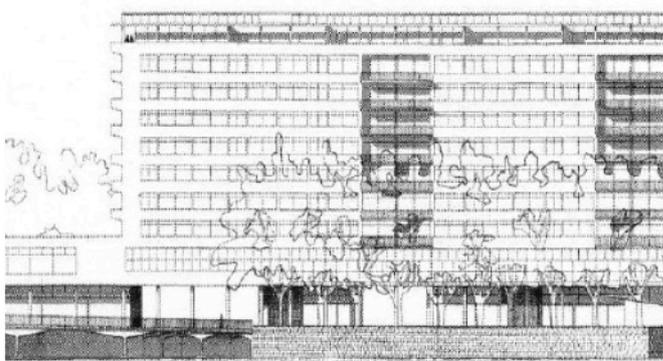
Max Bill, *Proposal for a Garden-City at the Lake Zürich* (1953). Elevation plan.
